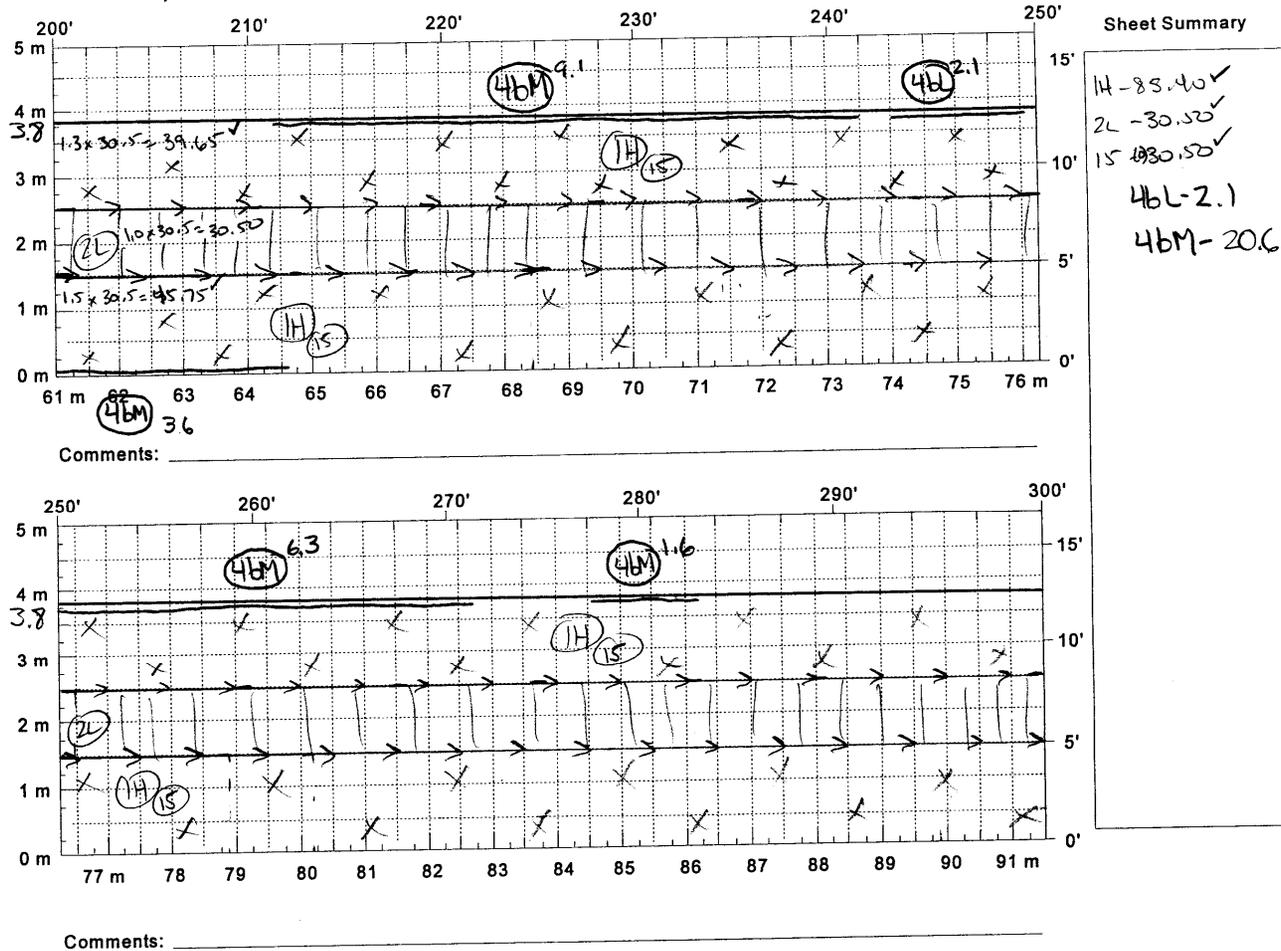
Pavement Distress Map; Station 2+00 to 3+00; Section 0505.
